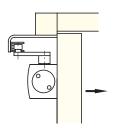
Parallel arm application Closer is fixed to the push side of the door using fixing bracket
